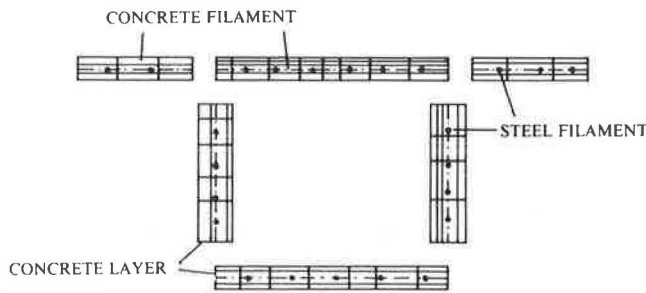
Box cross section discretized into concrete and longitudinal reinforcing steel filaments.
